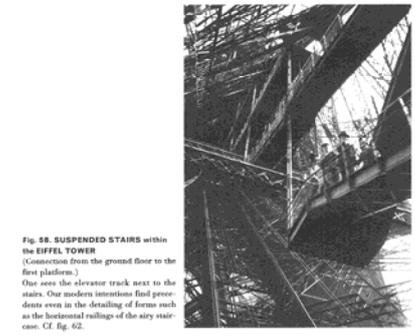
SUSPENDED STAIRS WITHIN THE EIFFEL TOWER
